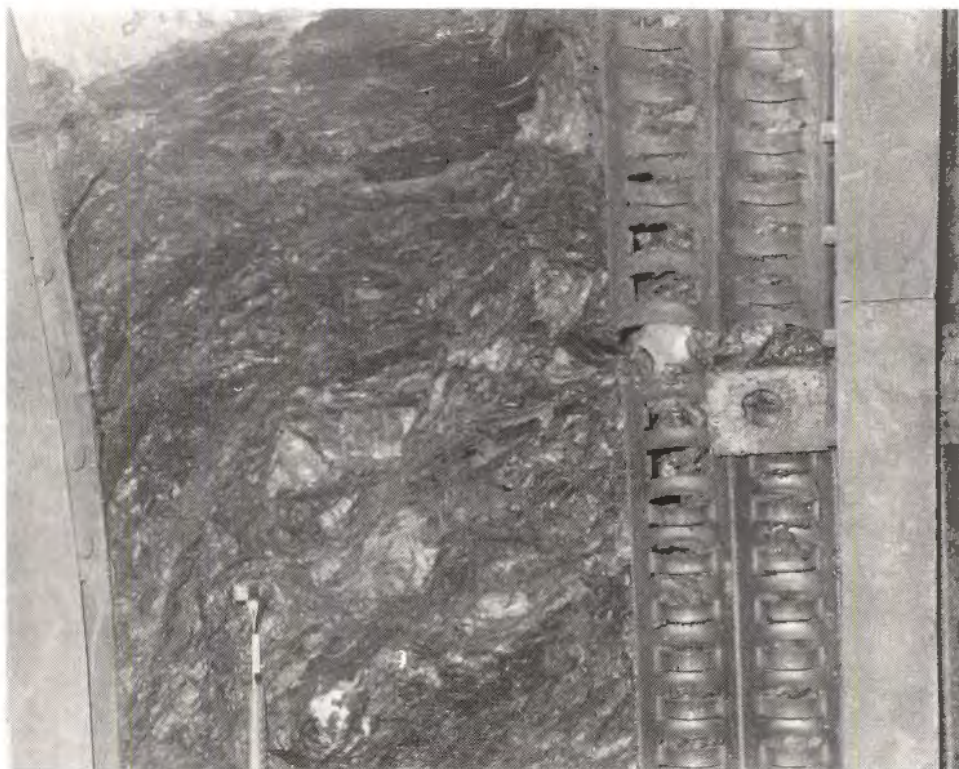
Shattered mudstone, Tees station 940 to 945
